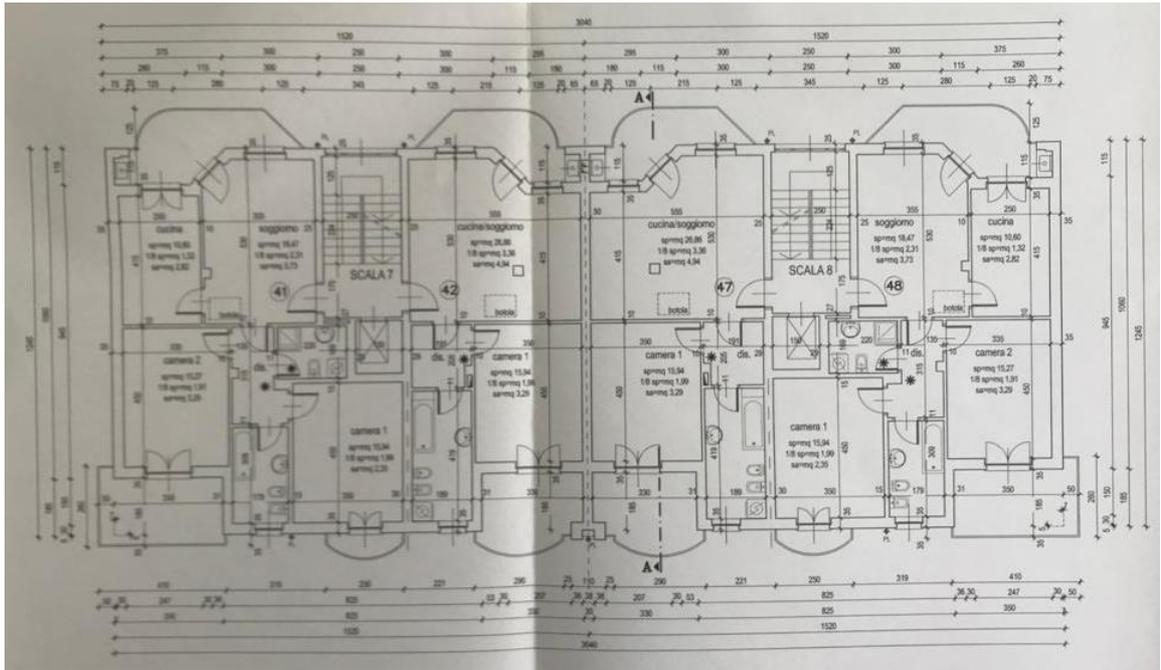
First Floor Plan (Via S.Francesco da Paola 5)
